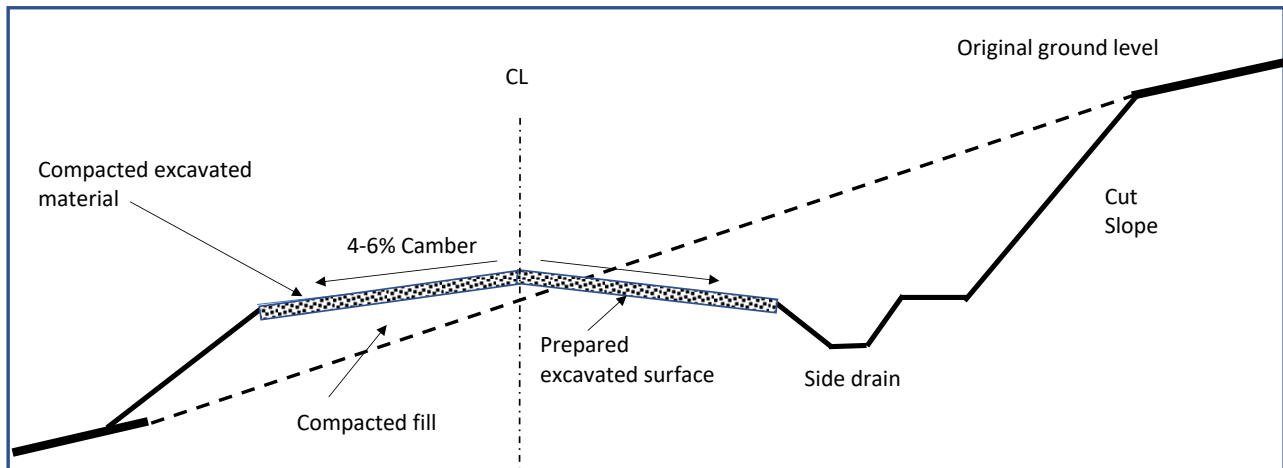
Typical Engineered Natural Surface Road Cross Section in Flat Terrain
